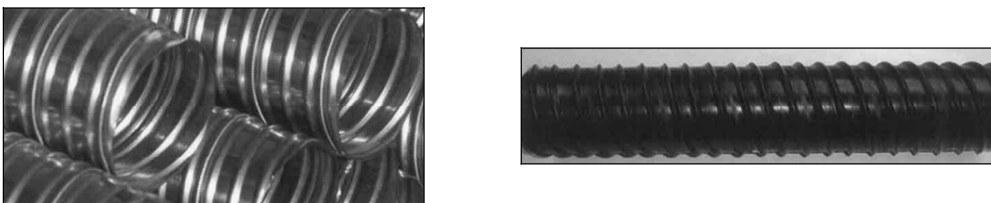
Steel and plastic ducts for corrosion protection of prestressing steel
